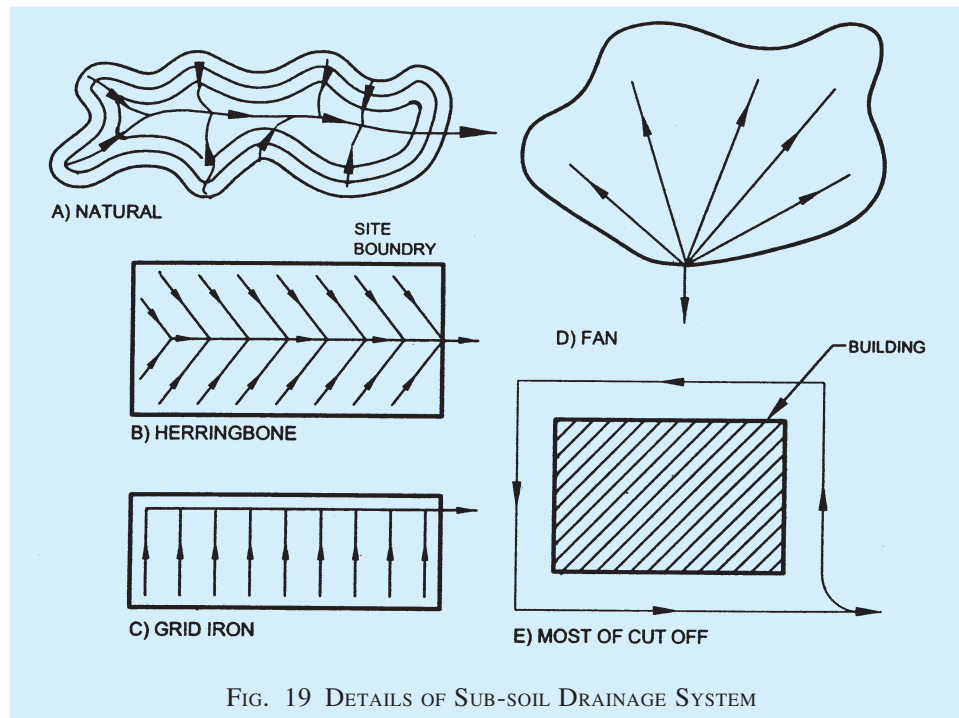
DETAILS OF SUB-SOIL DRAINAGE SYSTEM
